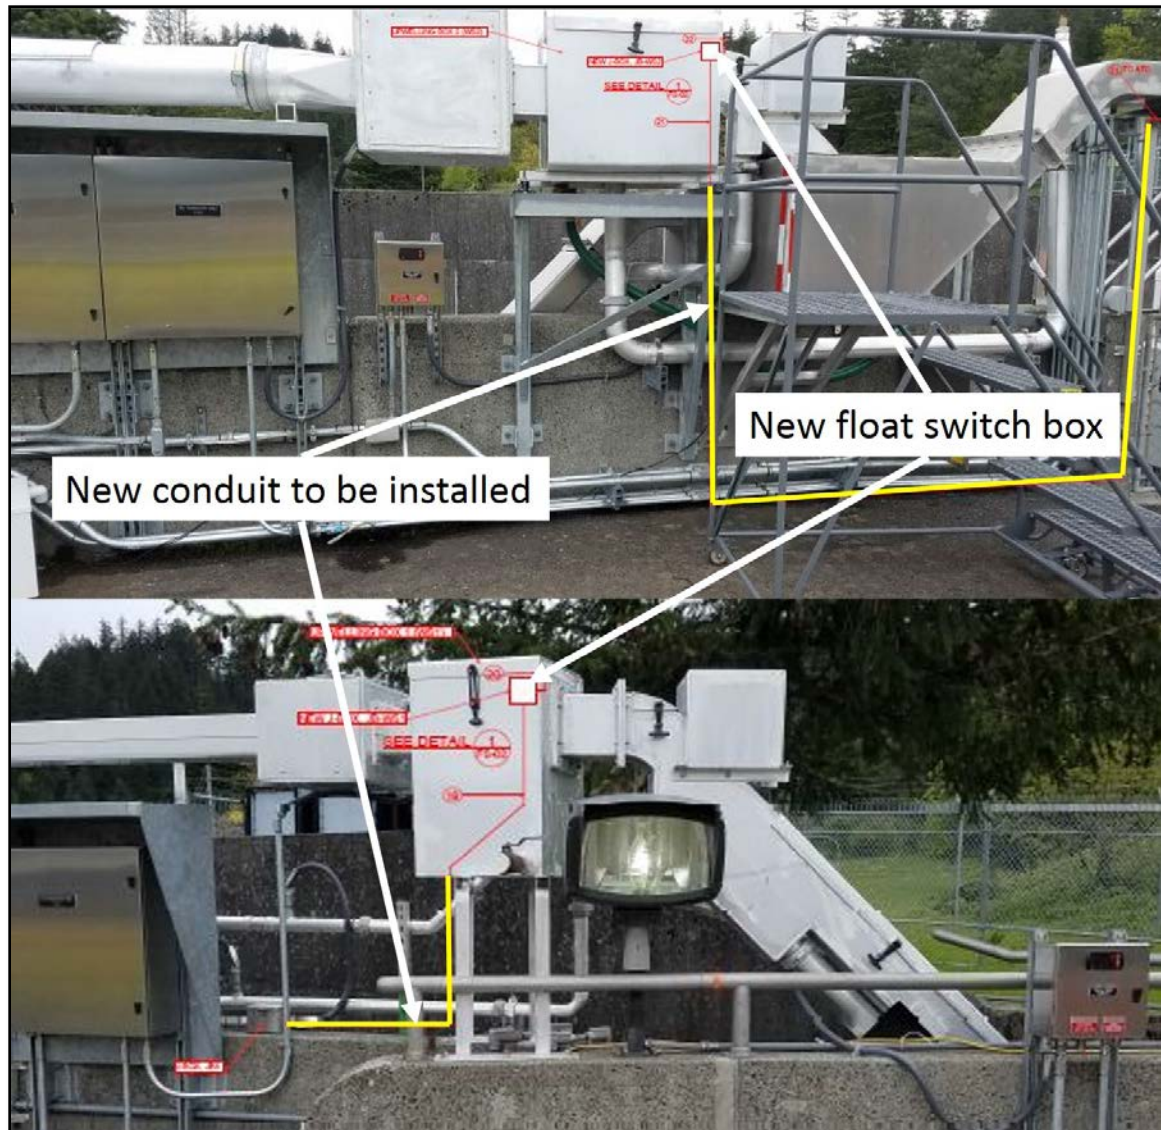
The Washington Shore LPS upwelling boxes to be retrofitted with new flow sensors (white boxes) and associated conduit (yellow lines) to be installed.
